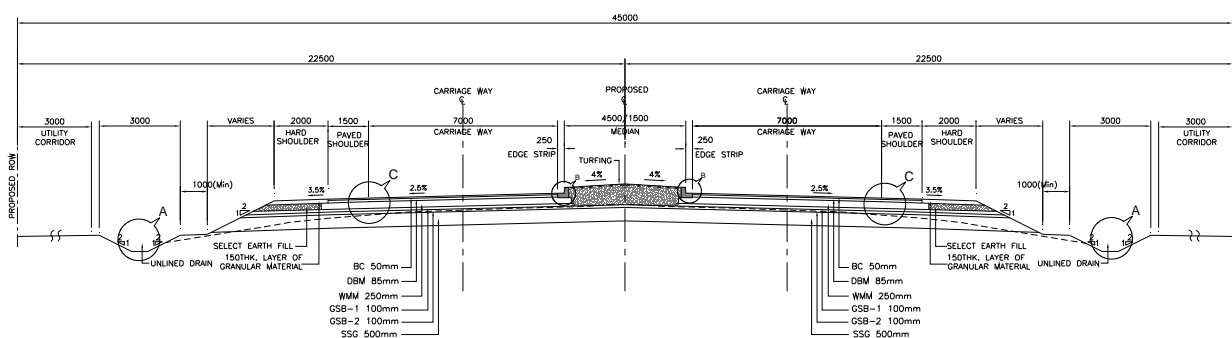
TYPICAL CROSS SECTION FOR NEW CONSTRUCTION
